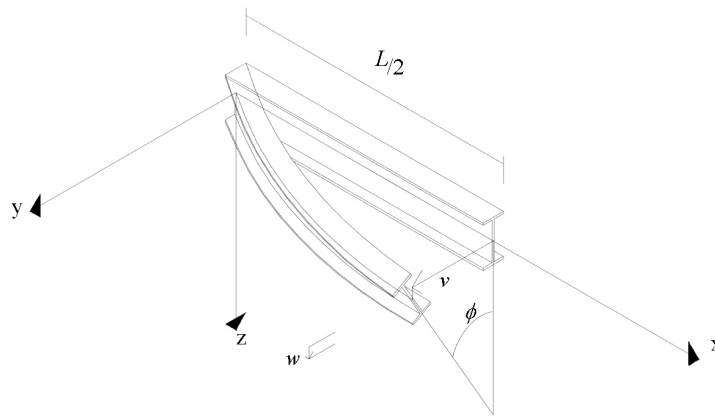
Deformed shape of a steel I-beam due to LTB.
